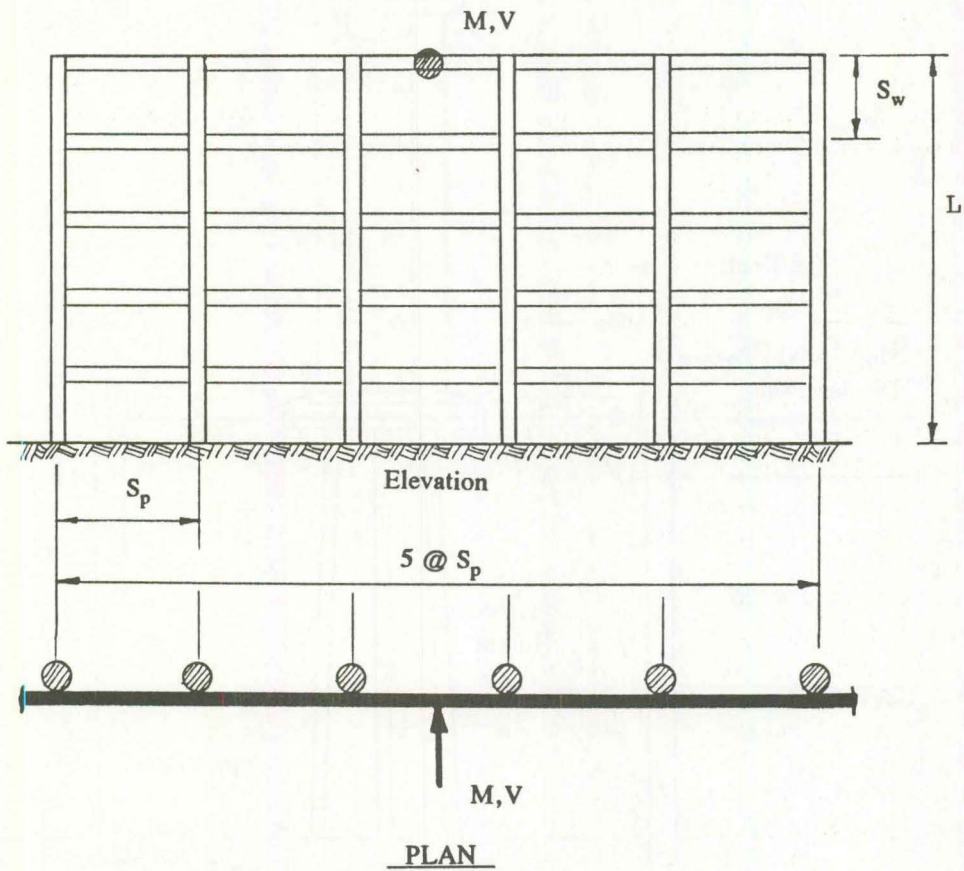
Section of Pile Supported Pier Protection System Evaluated for the Tasman Bridge [12].
